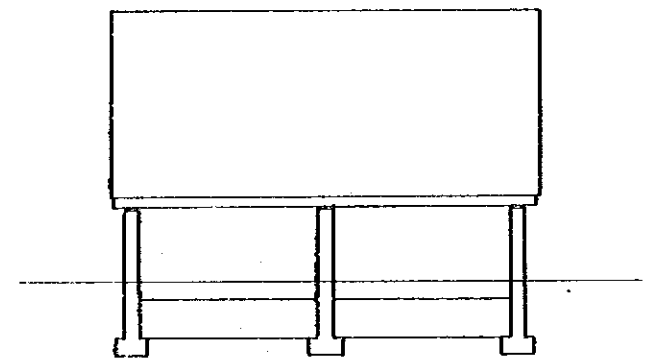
Layout of Tower and Earth of Dongola
